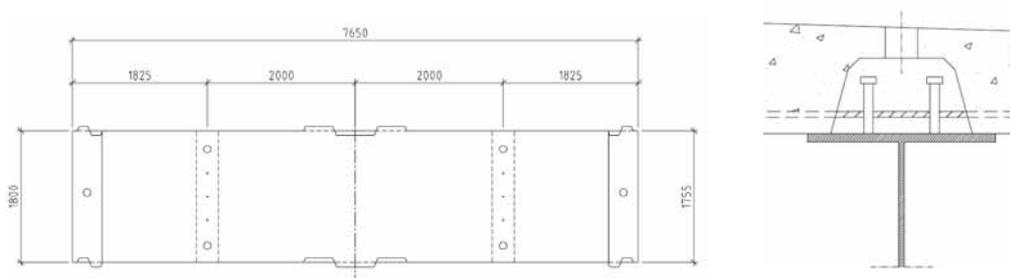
Plan of a bridge deck element and cross section above girder.
